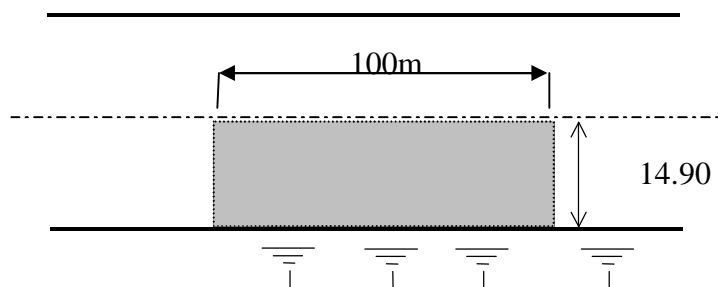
Plan of Road Surface (Out of Scale)
